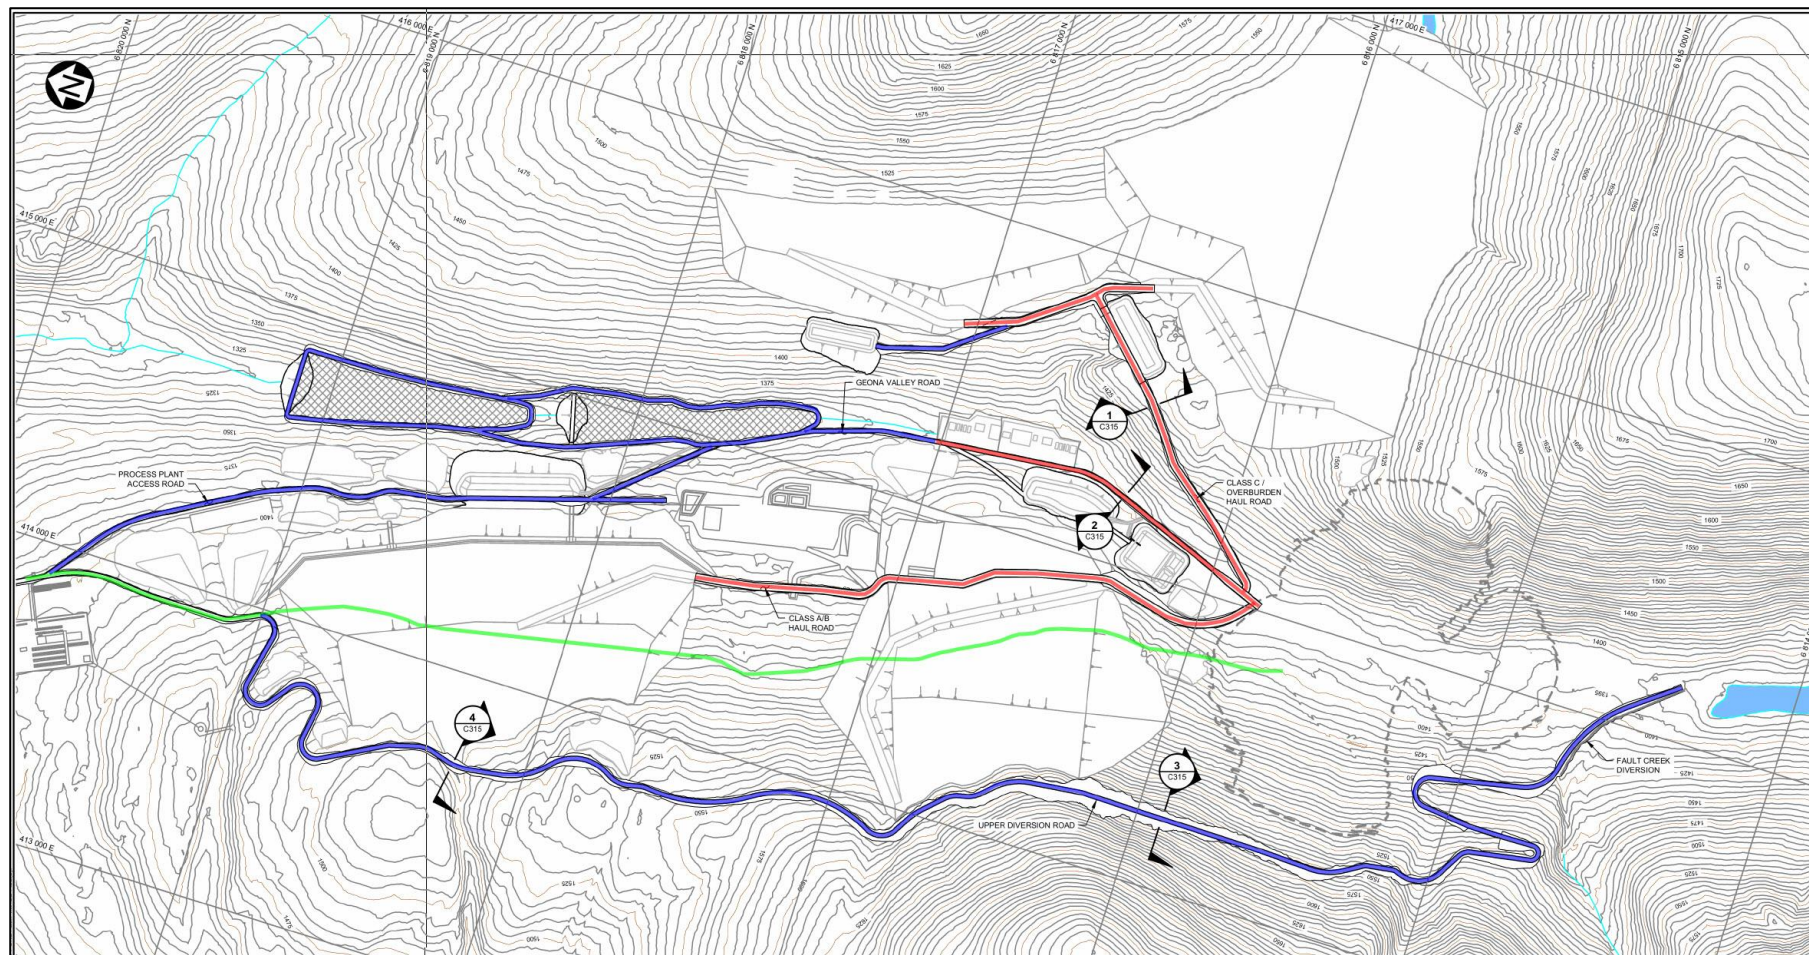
Site roads – green indicates road upgrade, blue indicates new light vehicle road, red indicates mine haul road
